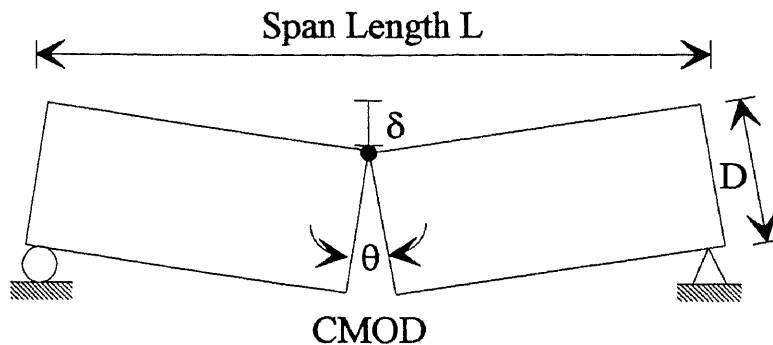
Collapse Mechanism of Beam at Failure Stage
